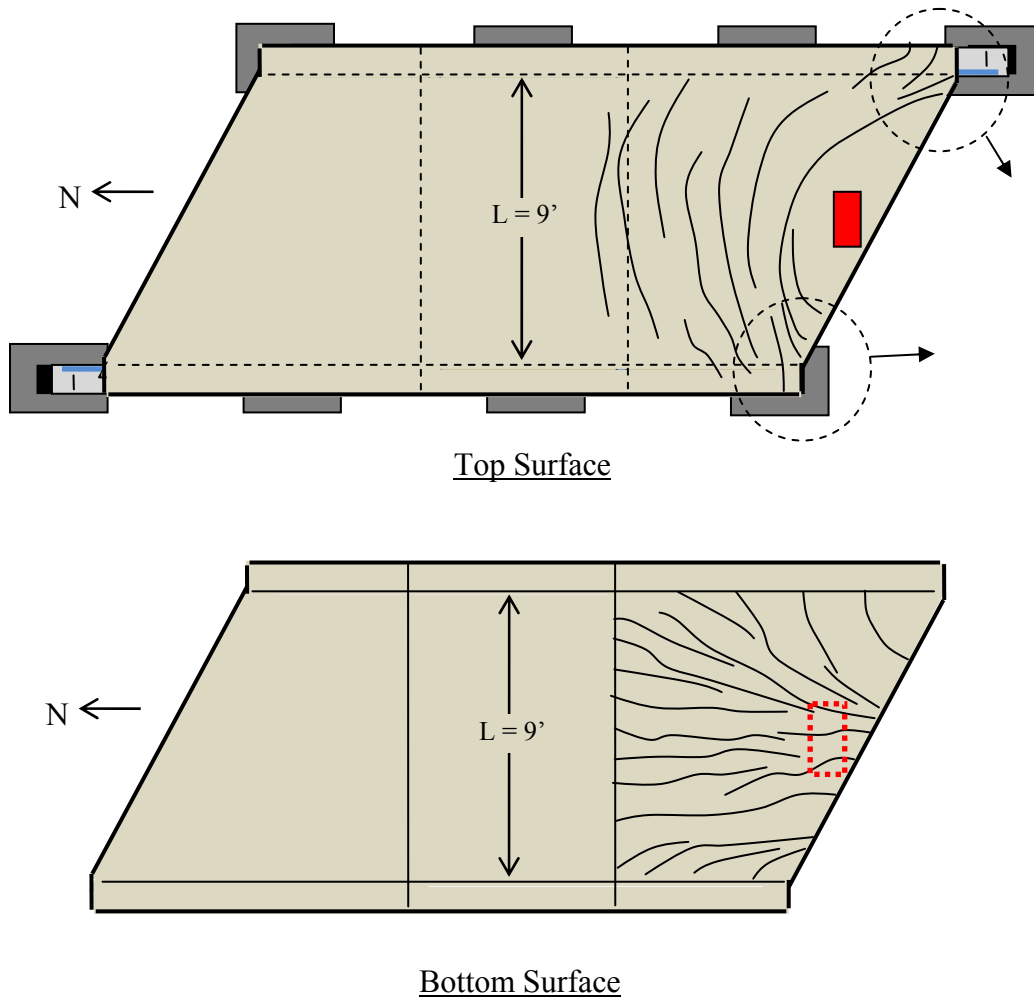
Cracking at Failure of Skewed End 10A under Load at Midspan
